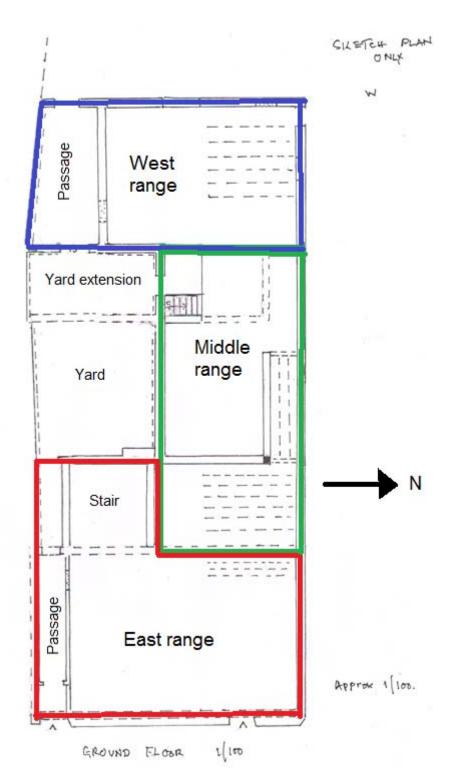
Ground-floor plan of 7–9 North Bar Within (YVBSG)
